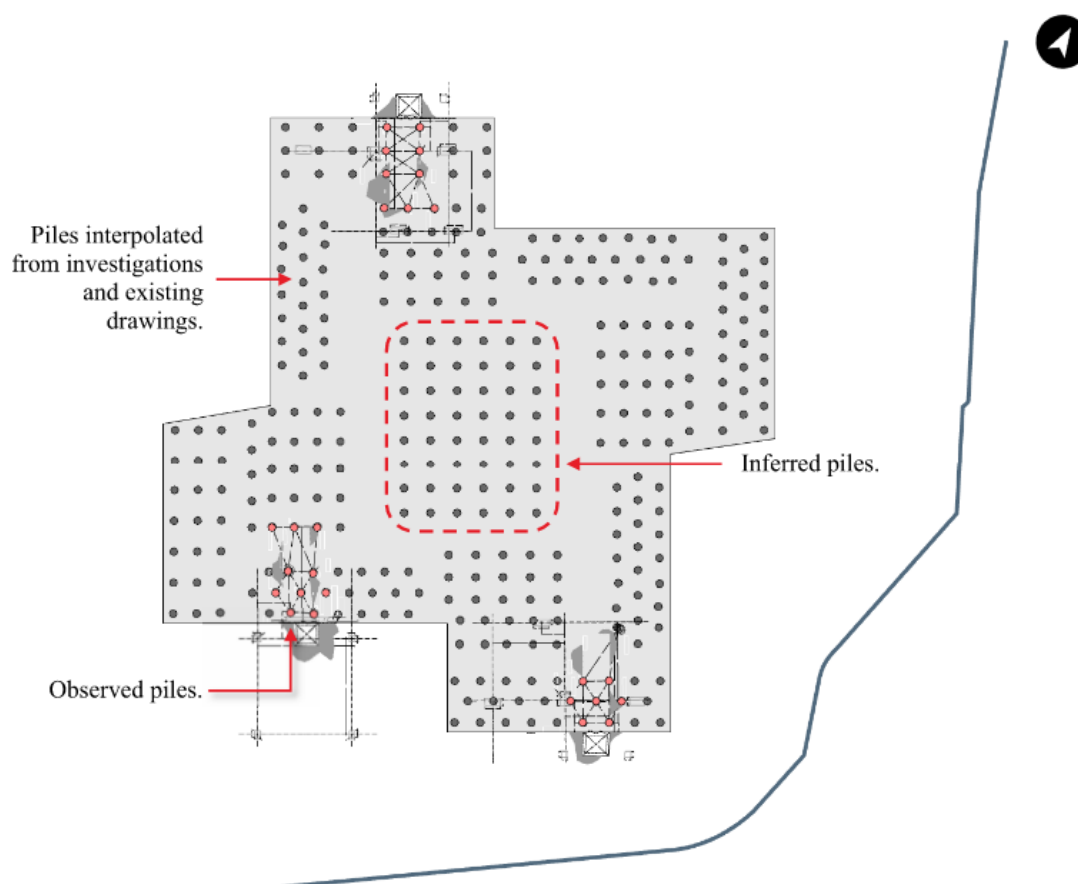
Plan showing anticipated existing foundations of Euston Tower
